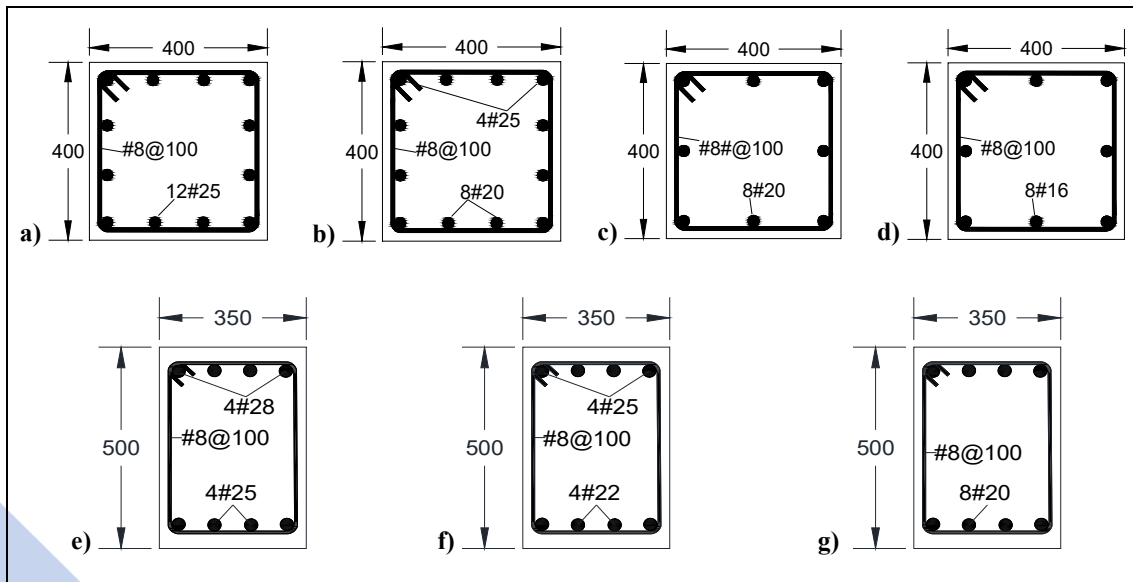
Cross Section Details of VP Series a) Column of 1st floor b) Column of 2nd floor c) Column of 3rd floor d) Column of 4th and 5th floor e) Beam of 1st floor f) Beam of 2nd and 3rd floor and g) Beam of 4th and 5th floor.
